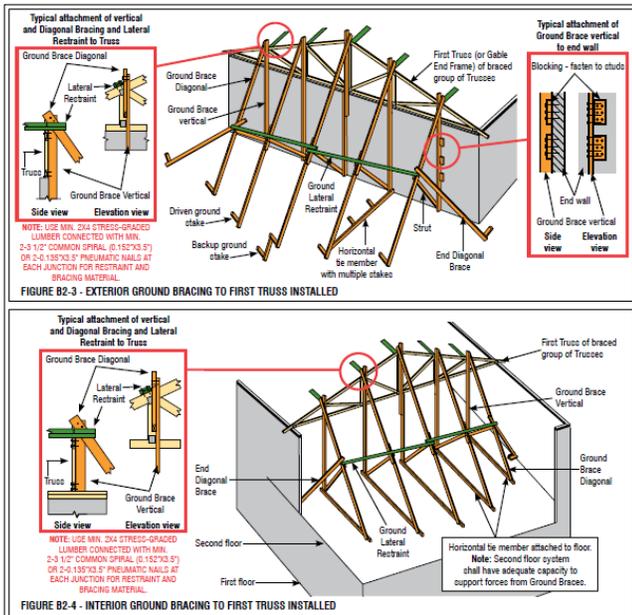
Example of gable truss bracing during truss installation (Source: BCSI Canada).
